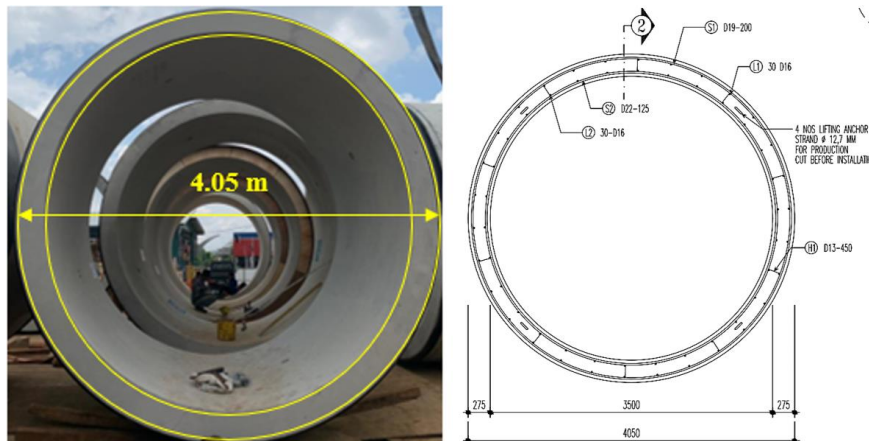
(a) Pipe in the Field (b) Pipe Structure
